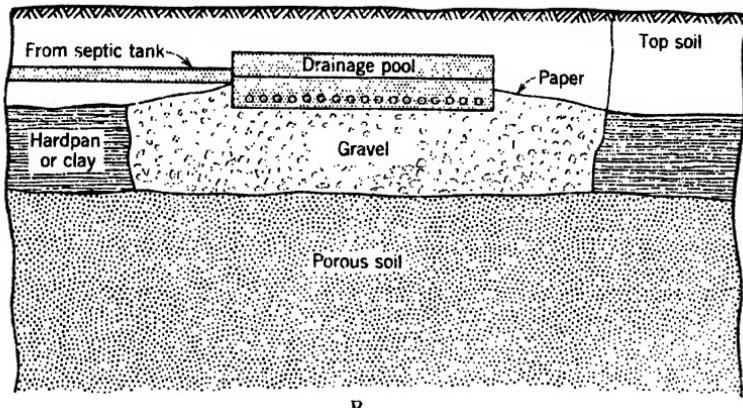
Plans for seepage pits as a means of liquid effluent disposal. A bed of gravel around the outside of the open-jointed wall will improve the performance. B is a plan for a seepage pit where impervious layers close to the surface are underlain by porous layers.
